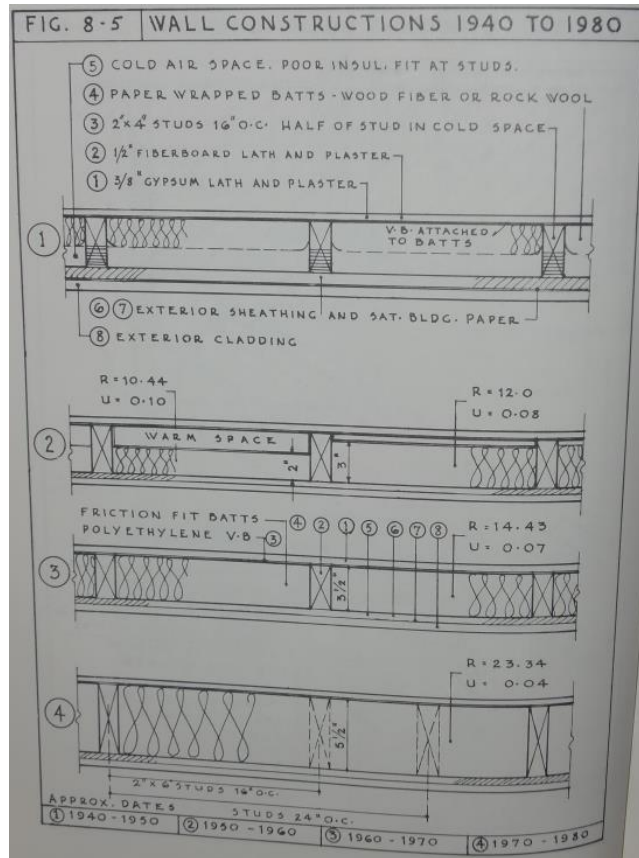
Exterior wall section between 1940 and 1980. Source: Watson, 1983, p. 76.
